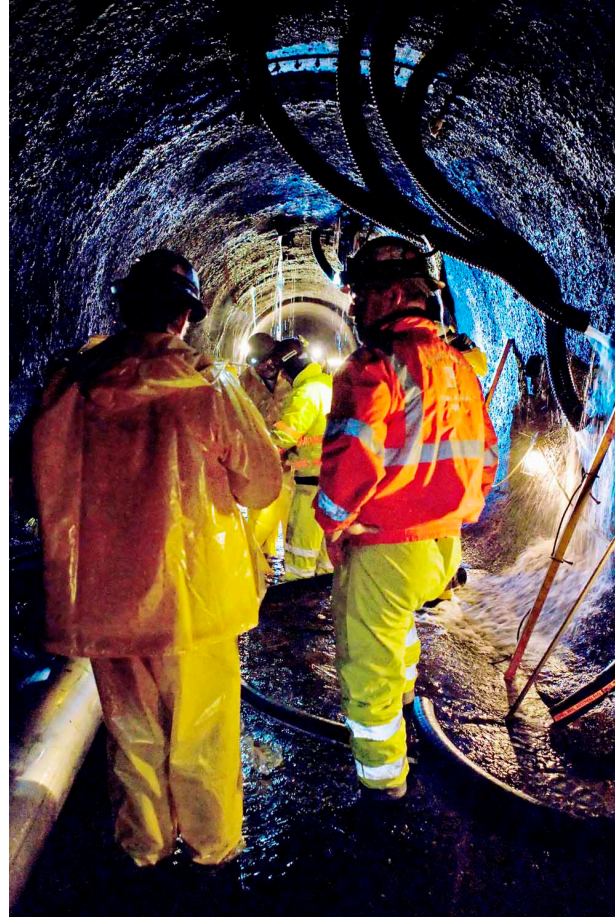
Southfork Adit Mountain Tunnel repairs manifold discussions
